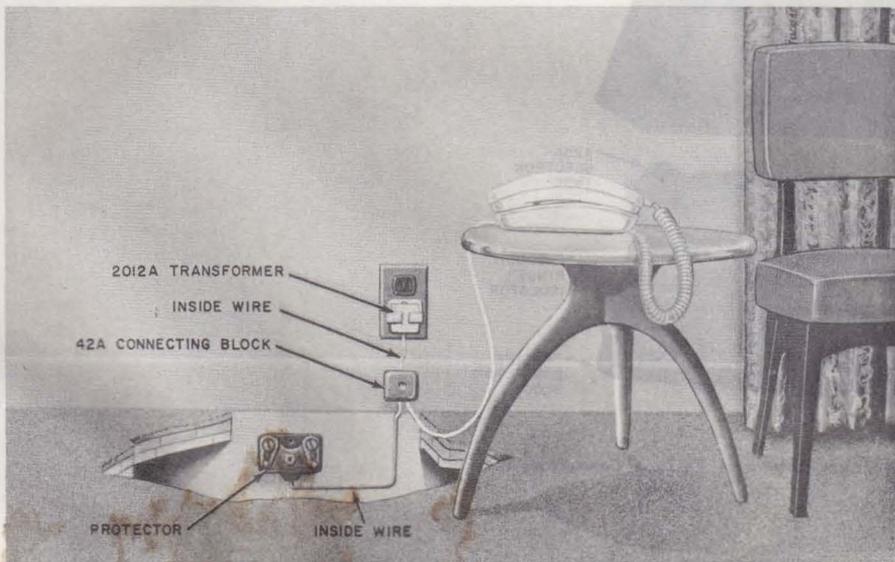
Typical Installation of AD1 Telephone Base With 220A Hand Telephone Set
